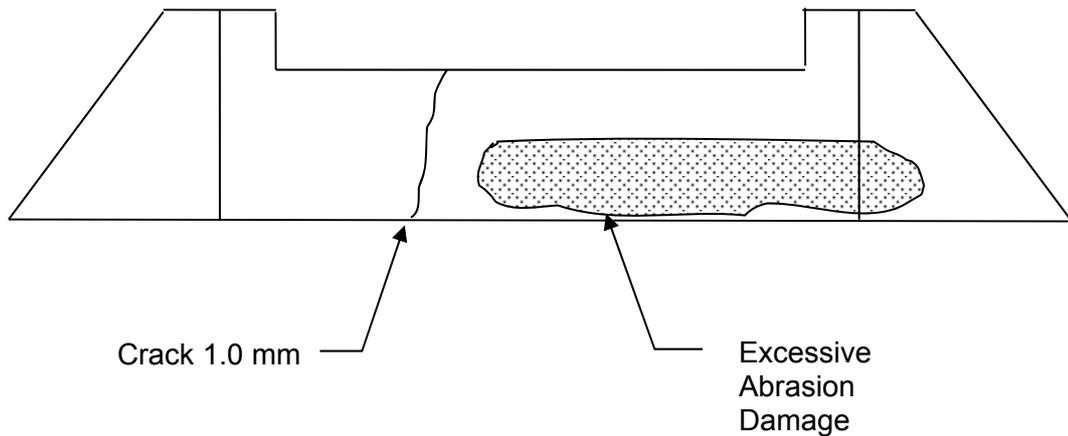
CONCRETE ABUTMENT WALL - DAMAGE INDICATION EXAMPLE
